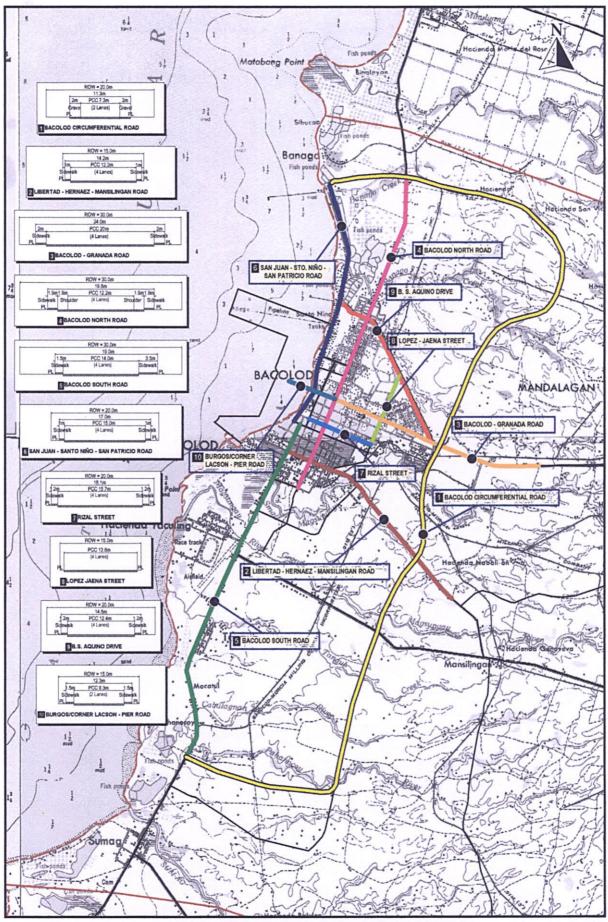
TYPICAL CROSS SECTIONS OF EXISTING ROADS IN URBAN AREA (BACOLOD CITY)
